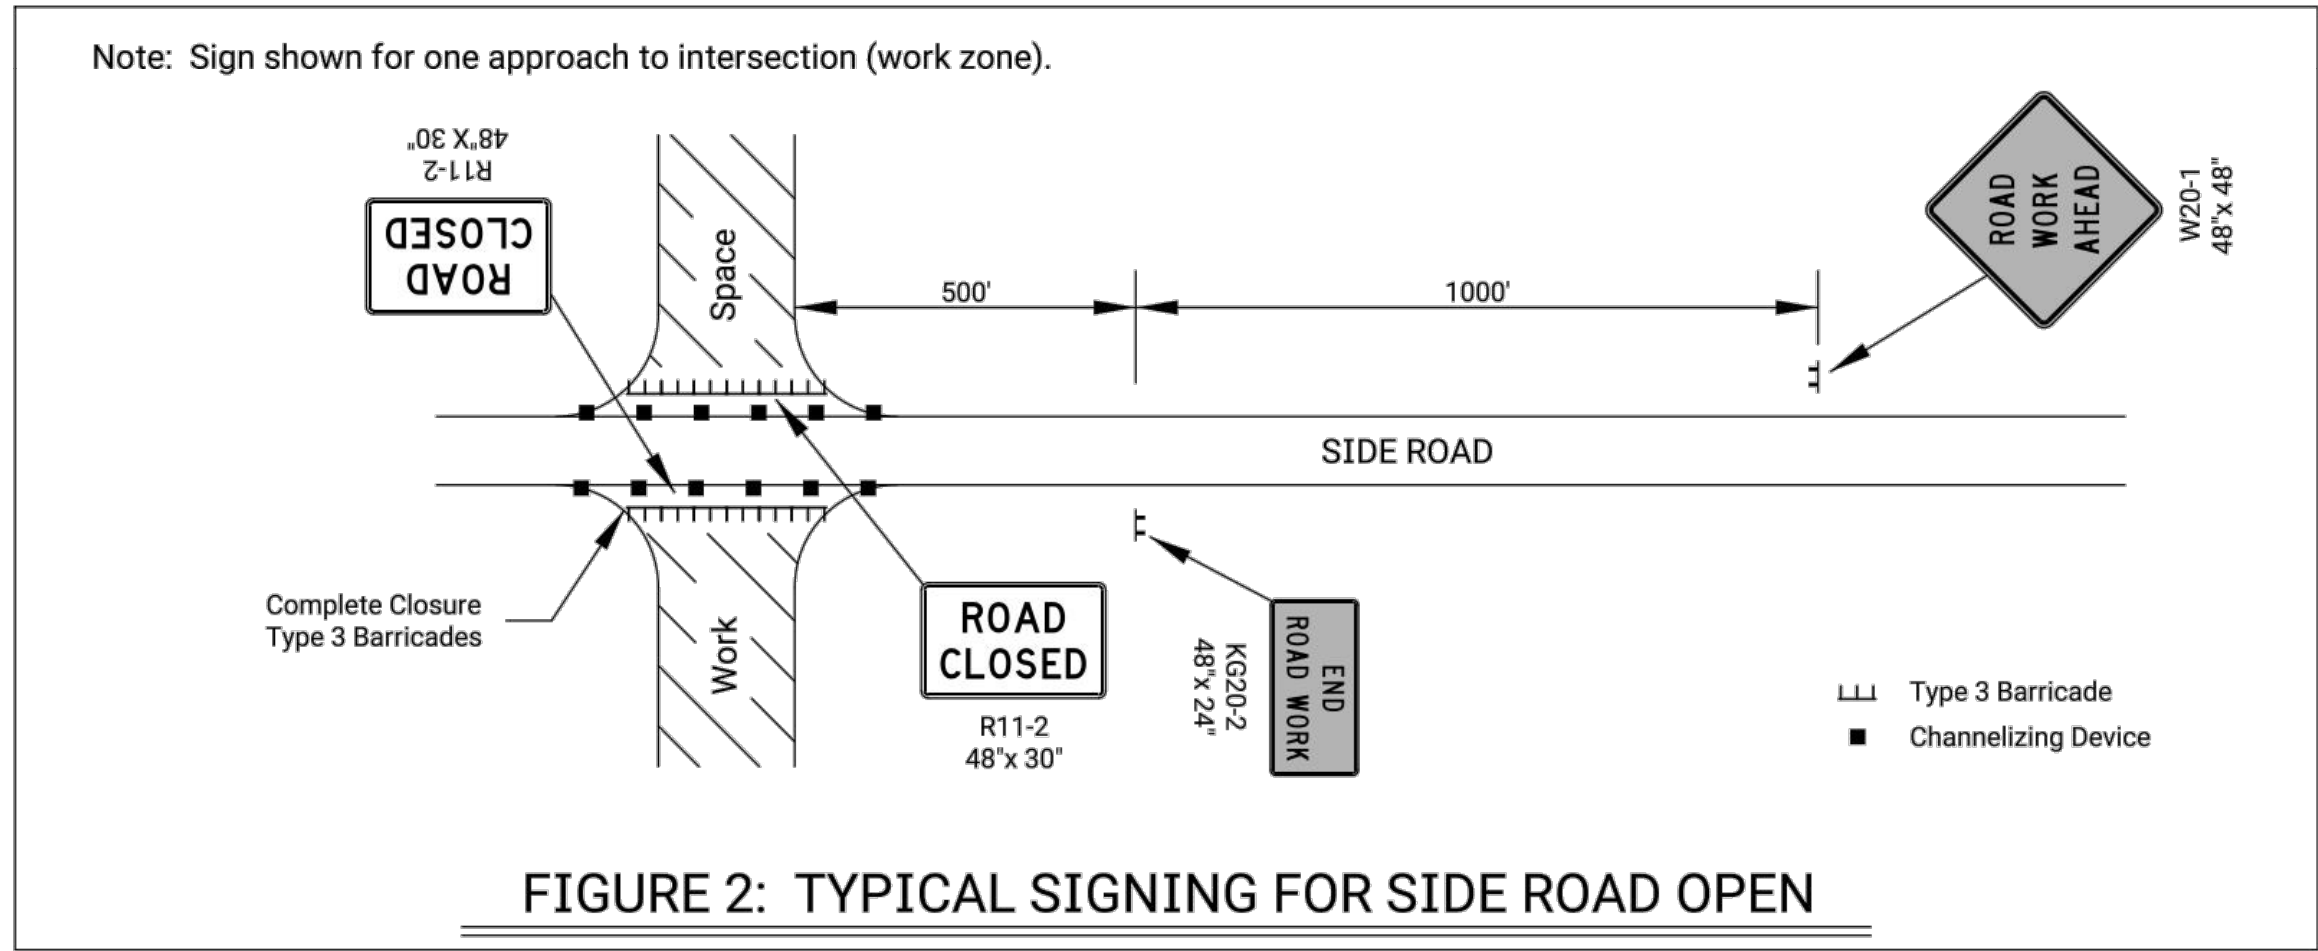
TYPICAL SIGNING FOR SIDE ROAD OPEN
